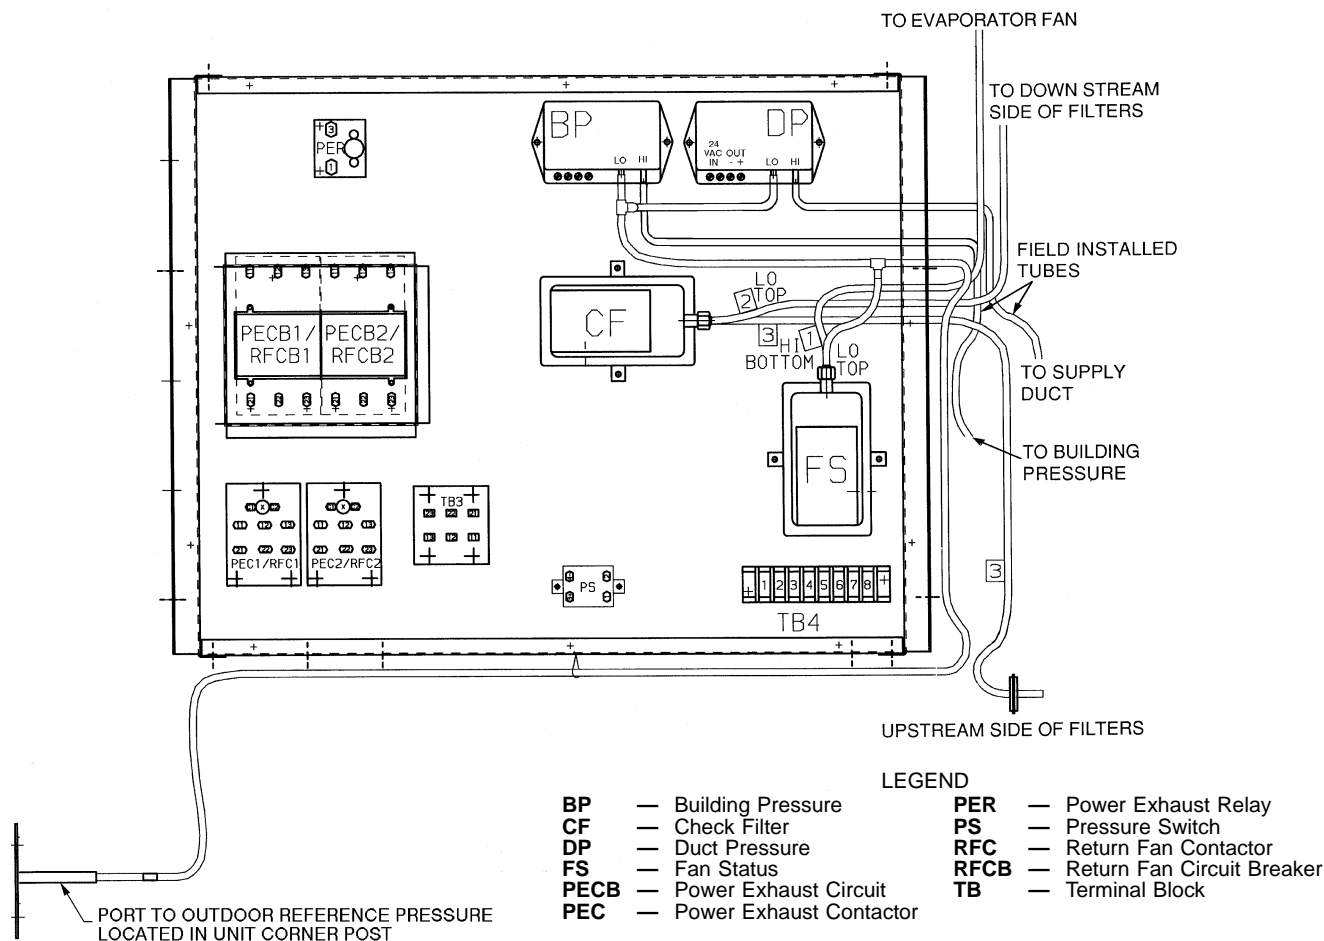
Auxiliary Control Box Details; Size 054-074 Units
